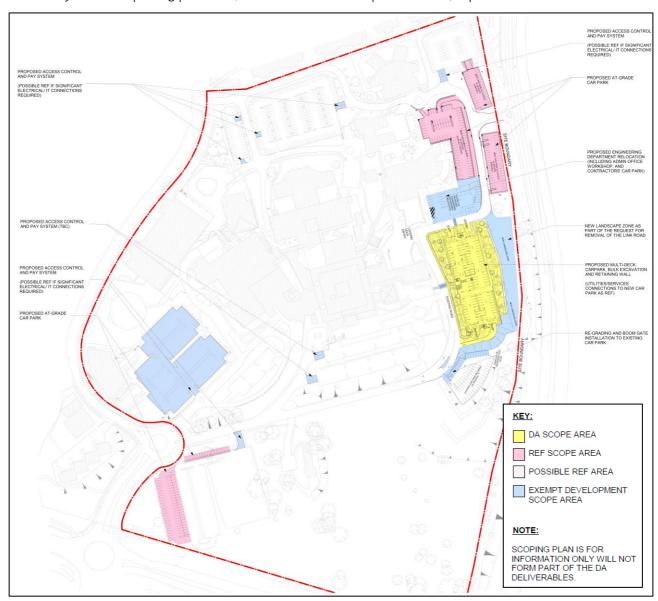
Proposed multi-deck and on-grade car park facilities (outside the scope of the SSD) to accompany Campbelltown Hospital Redevelopment
